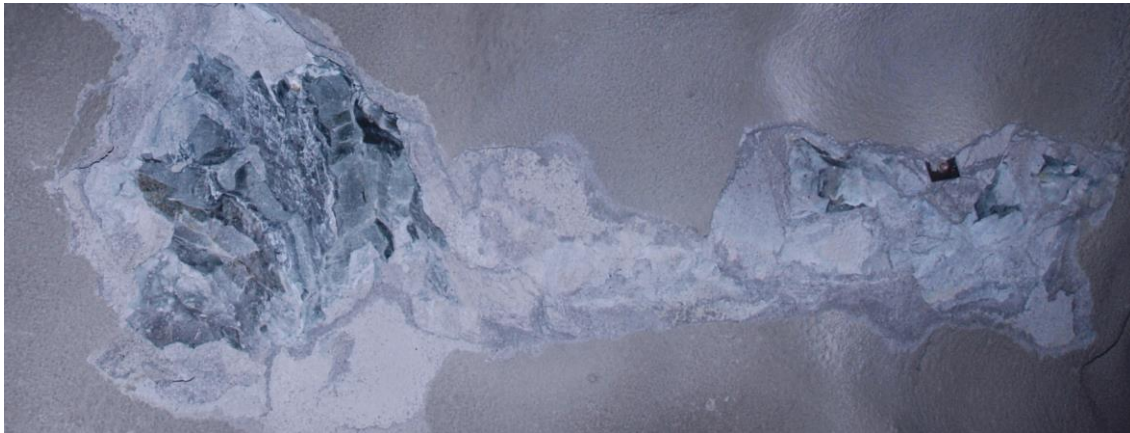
Shallow spalling failure where shotcrete has no external or internal steel mesh.
